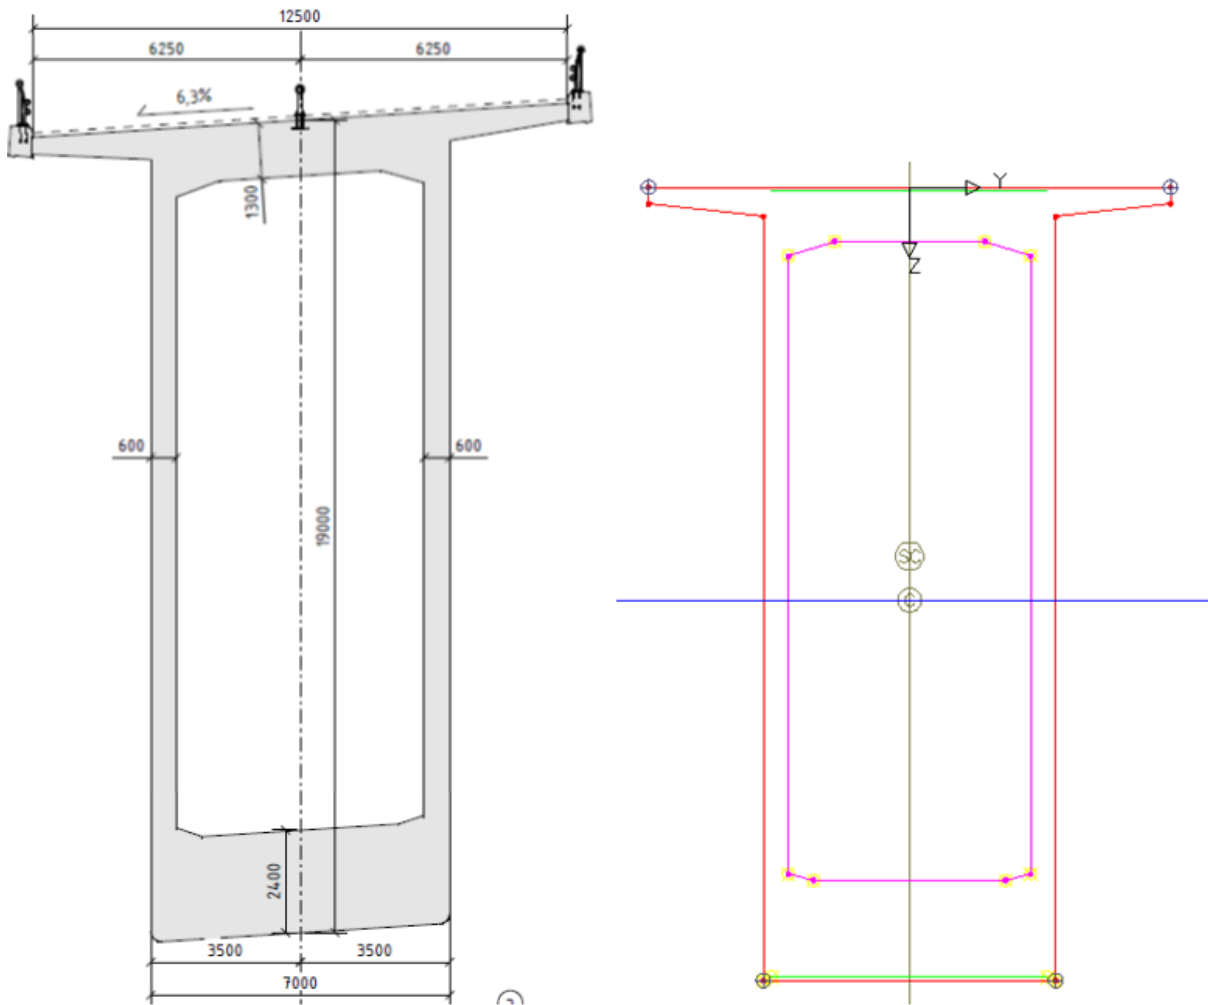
Cross sections of pier section, designed and programmed, cantilever phase, concrete variant
